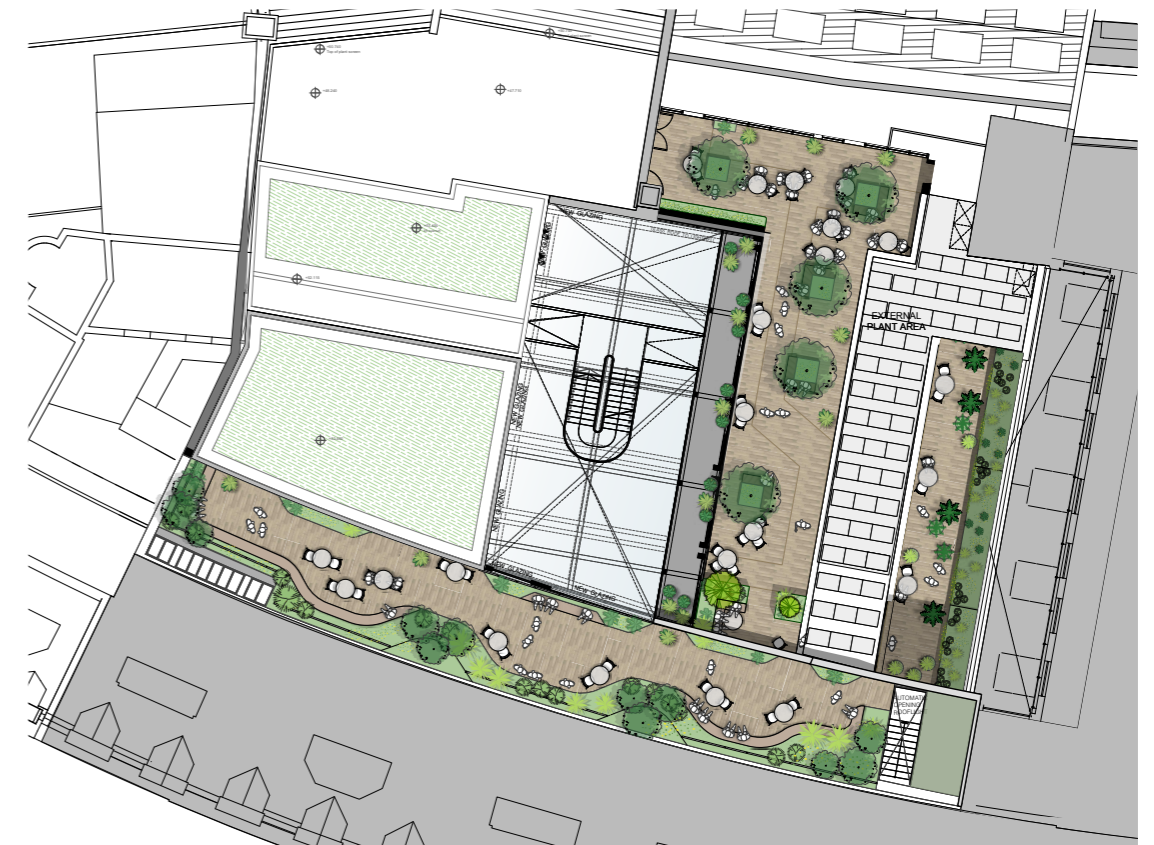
BIRDSEYE VIEW MASTERPLAN, INITIAL PROPOSALS
